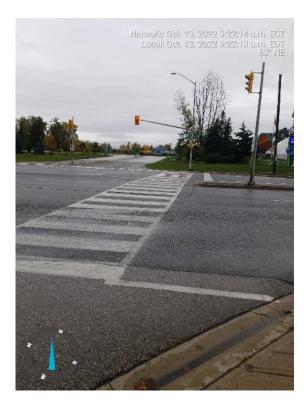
View of TRCA Conservation Area easement, facing west towards Finch Avenue West.
